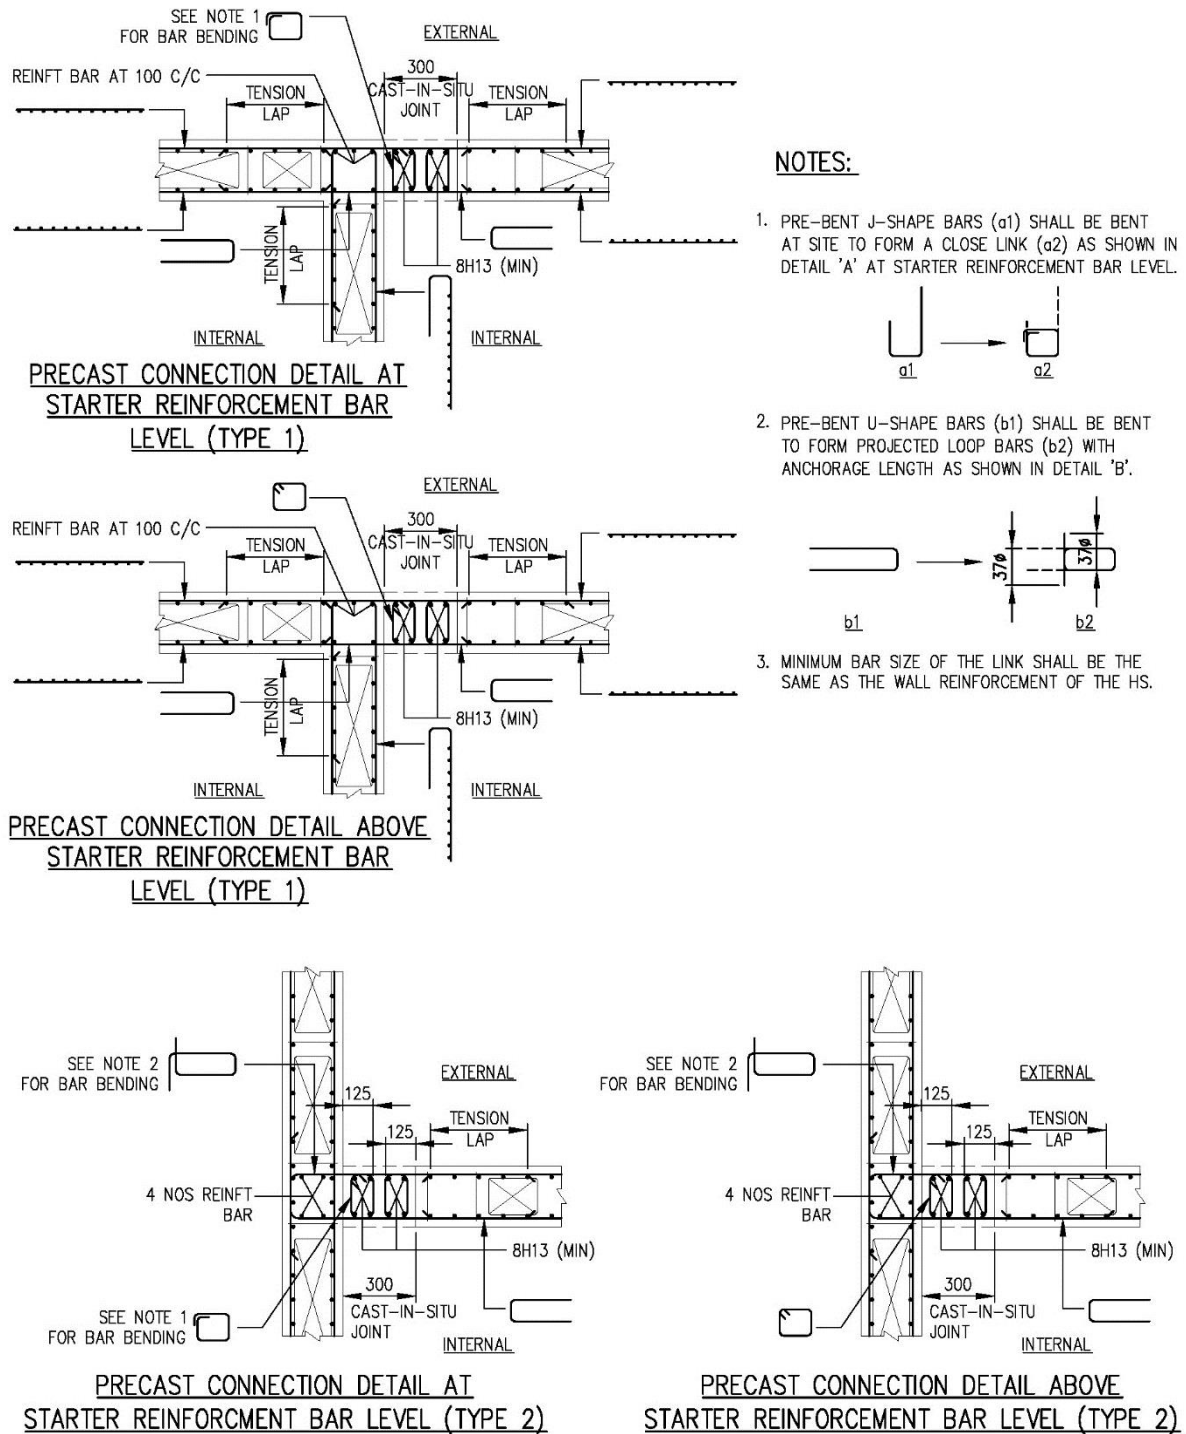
CONNECTION DETAILS BETWEEN TWO PRECAST HS
